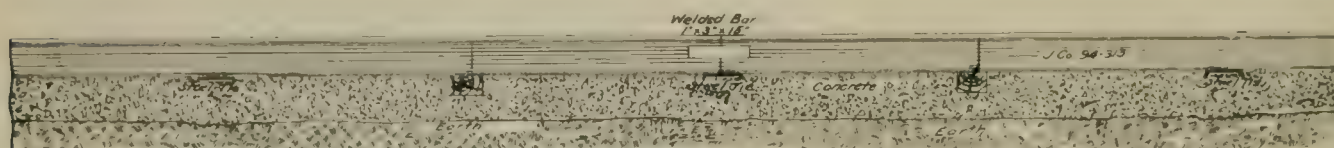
LONGITUDINAL SECTION BEFORE PAVING.
